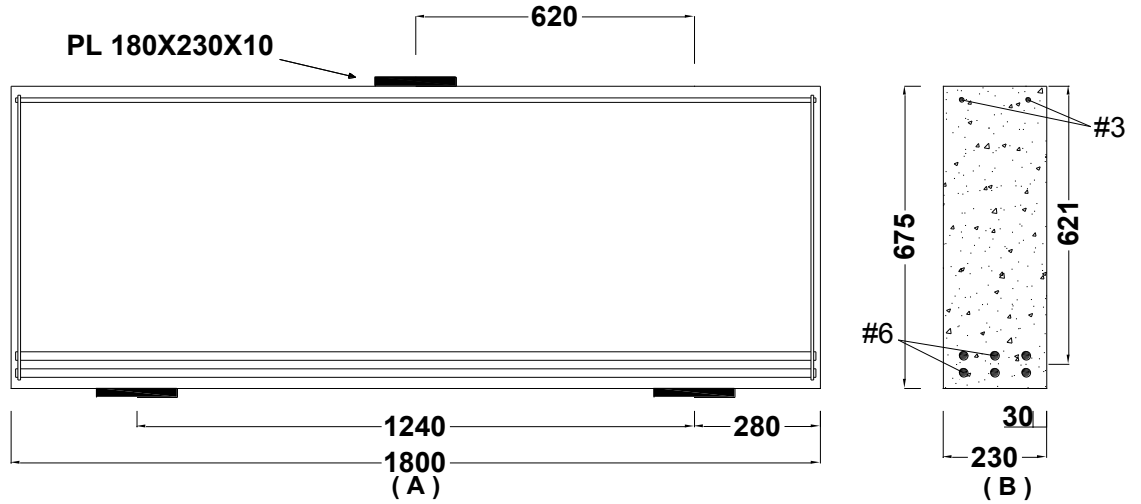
Beam A1/00: (A) elevation (B) cross section
